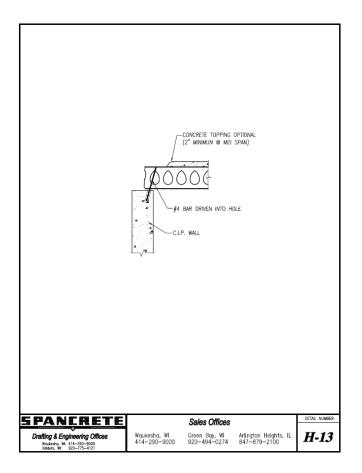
Spancrete Typical Hollow Core Slab to Parallel Wall Bearing Connections
